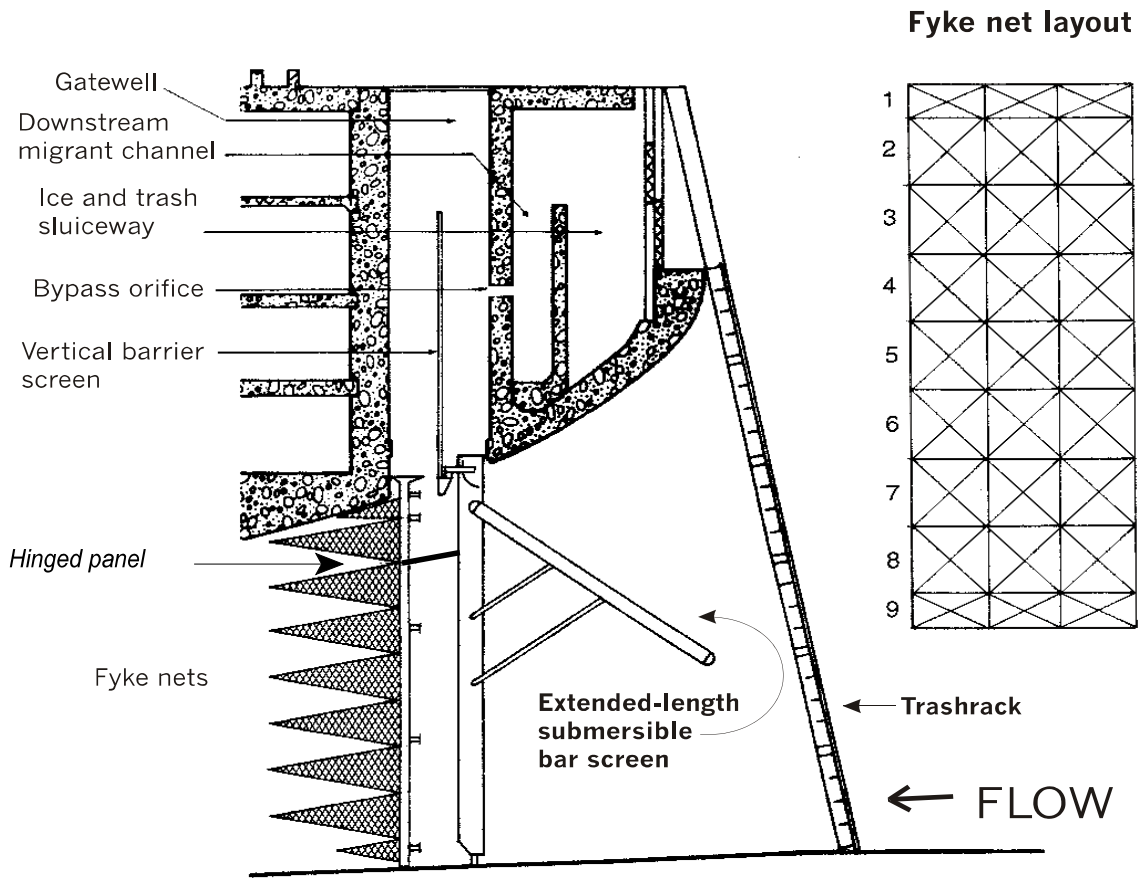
Cross section of turbine intake at Bonneville Dam First Powerhouse, showing extended-length bar screen and fish bypass system. Fyke-net layout shows nine net levels and three columns of nets.
